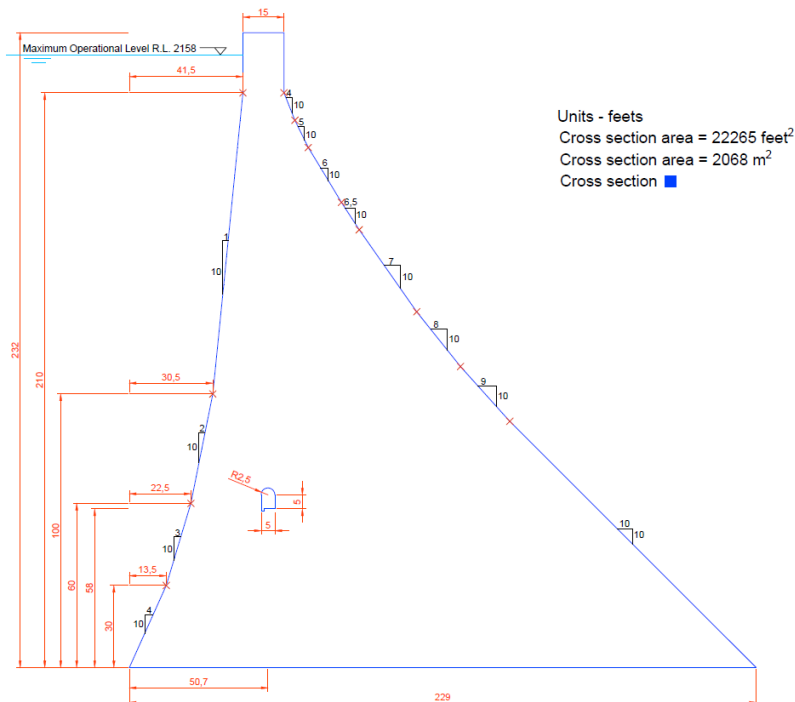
Cross section of Bhadra dam (non-overflow section).
